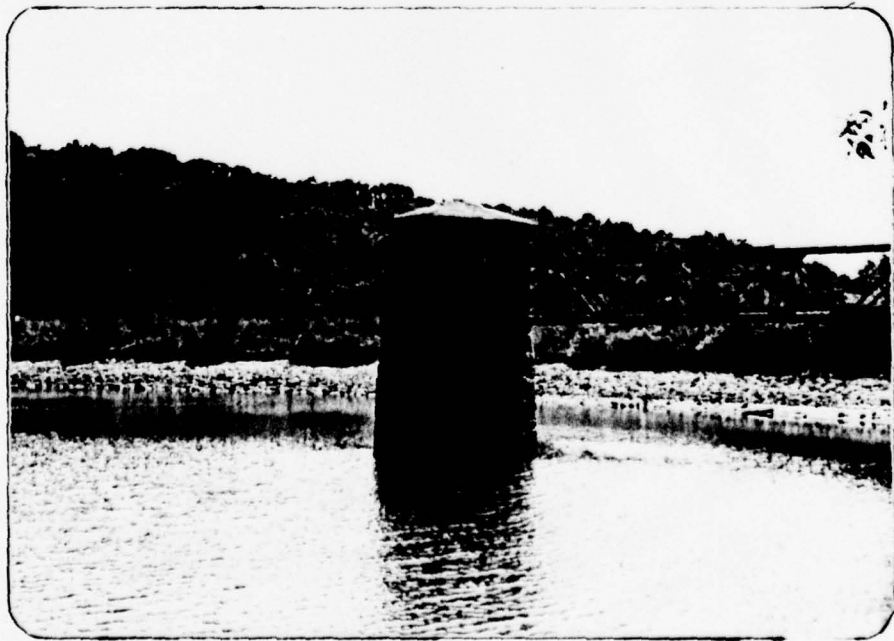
View Looking Downstream at Intake Tower and Upstream Slope of Embankment
